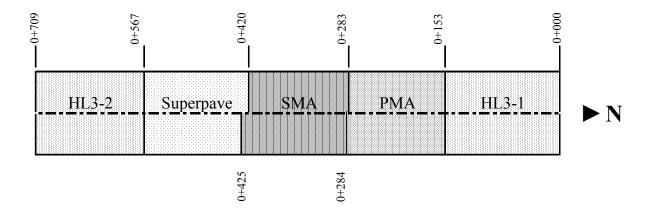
AC Pavement Sections at Waterloo Landfill Site.
